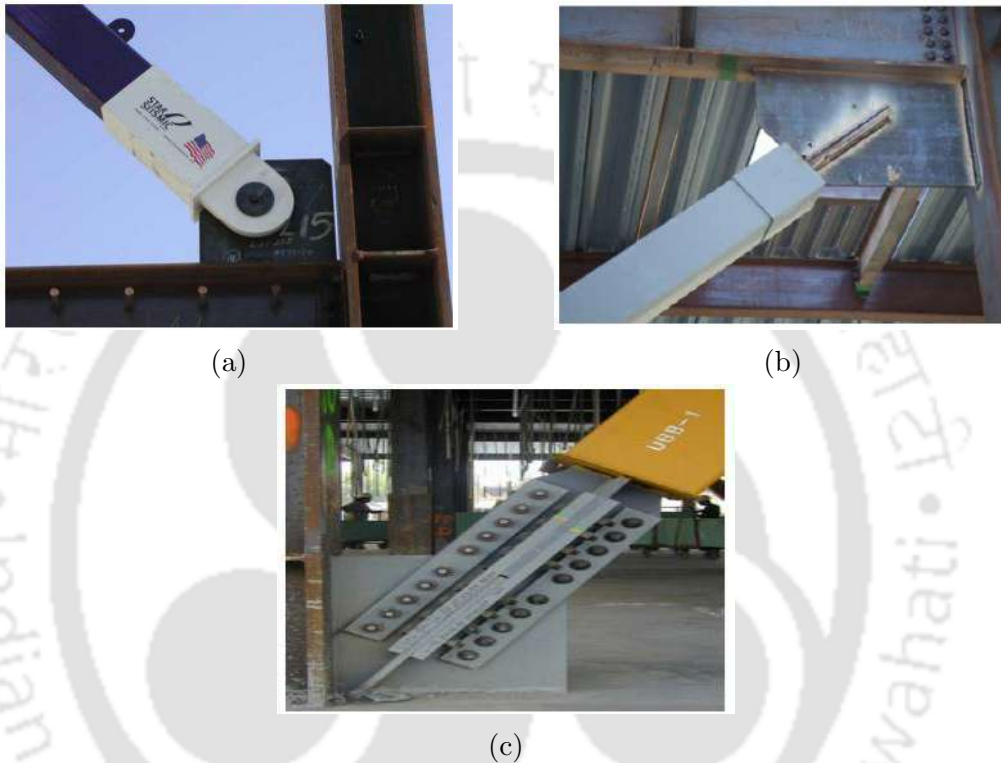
Different type of BRB connection; (a) pinned connection, (b) welded connection and (c) bolted connection
